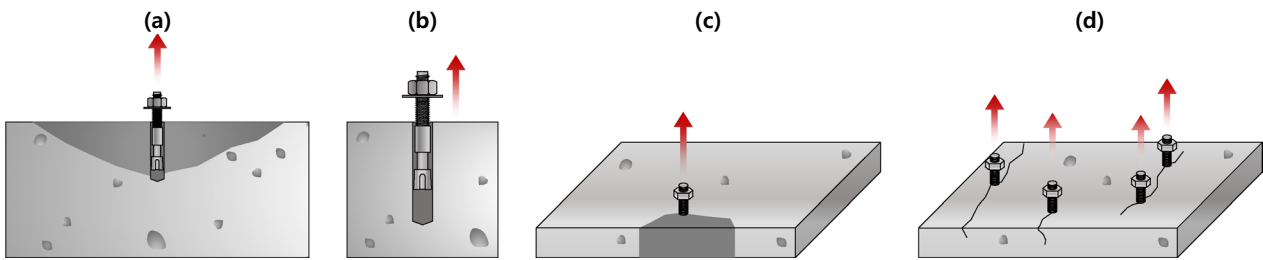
Failure mode of the anchor: a concrete breakout, b pull-out failure, c side-face blowout, d concrete splitting
